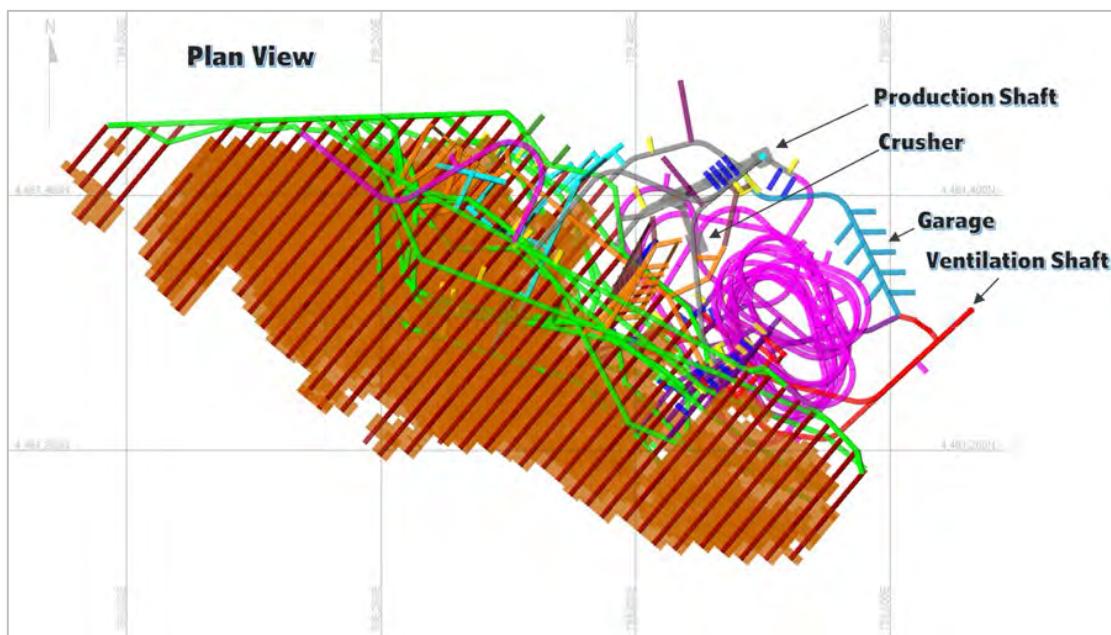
Level Layout with Stopes and Footwall Accesses (Rotated View Looking North)
